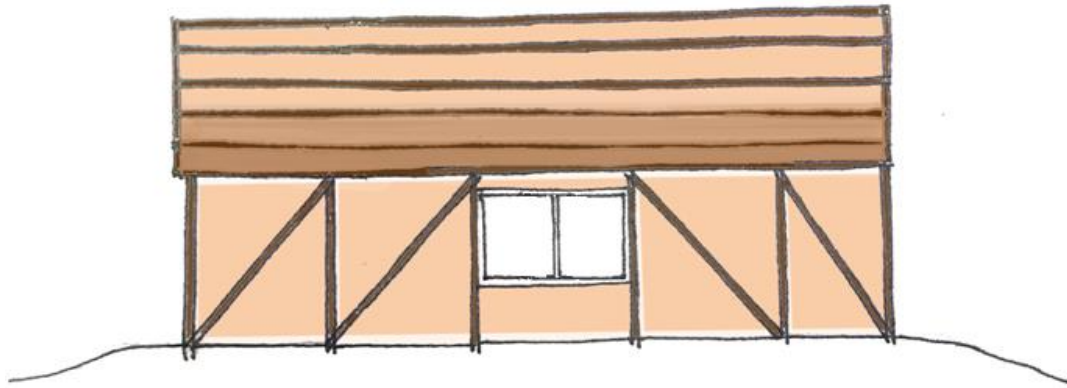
(A) GENERAL CONSTRUCTION PRACTICE OF HOUSES WITH GABLE ROOF
